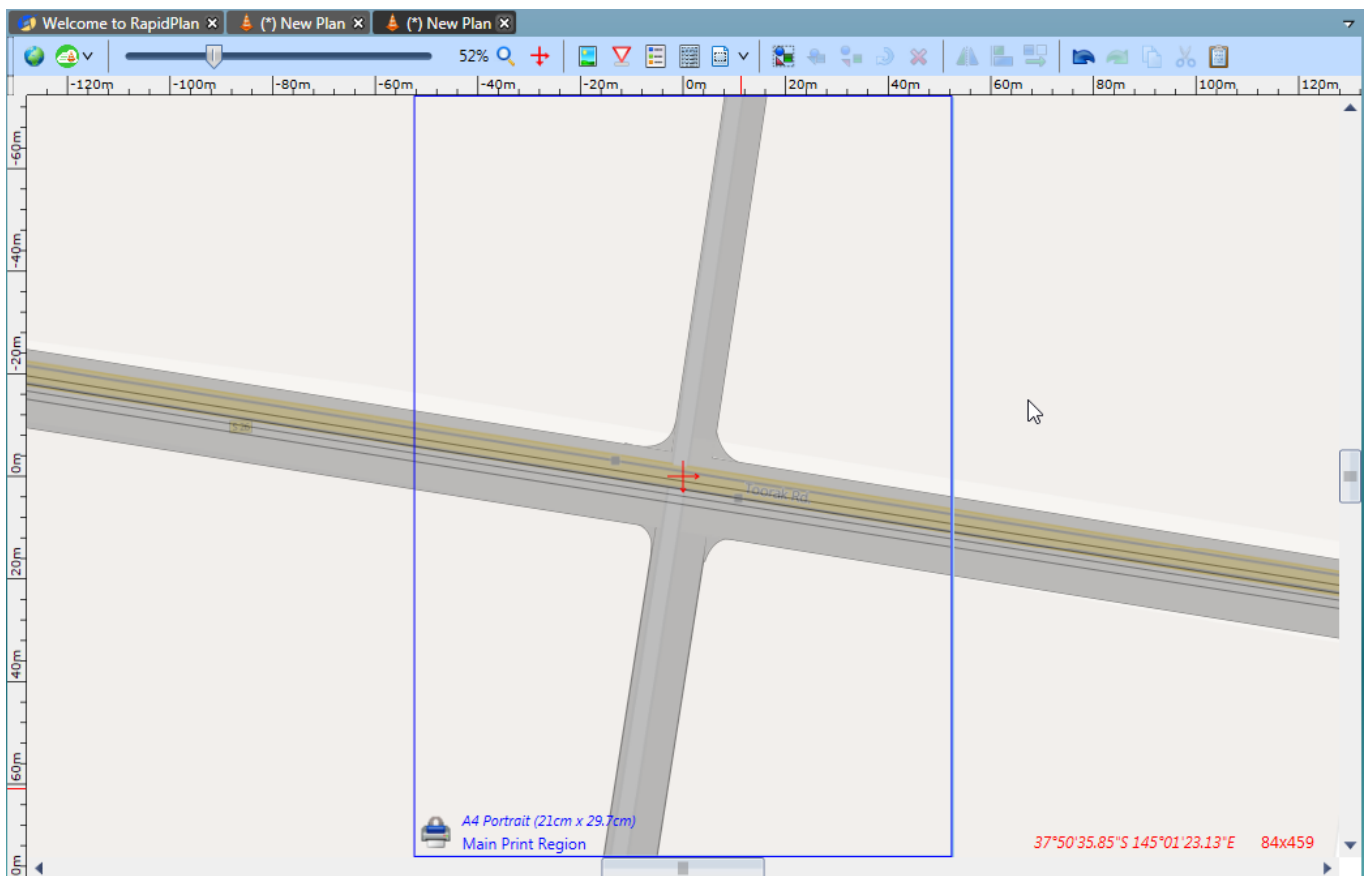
Road Corners have been Added and the Road Style Transferred
